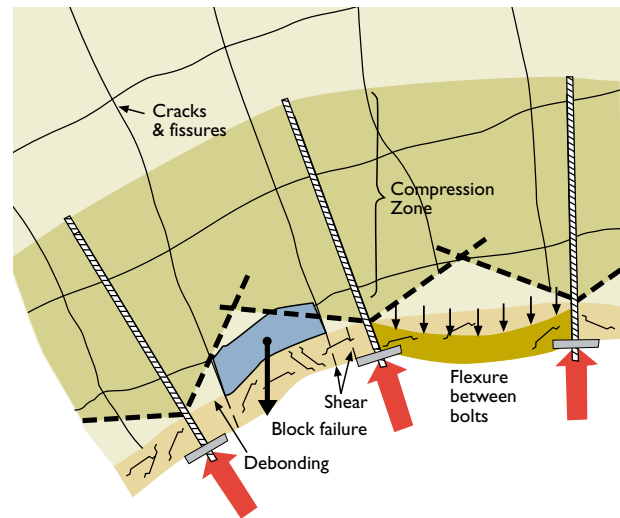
For tunnel linings SFERS spans between bolts and keeps the ground from unravelling. The compression arch formed by the rock bolts is the primary structural member.
